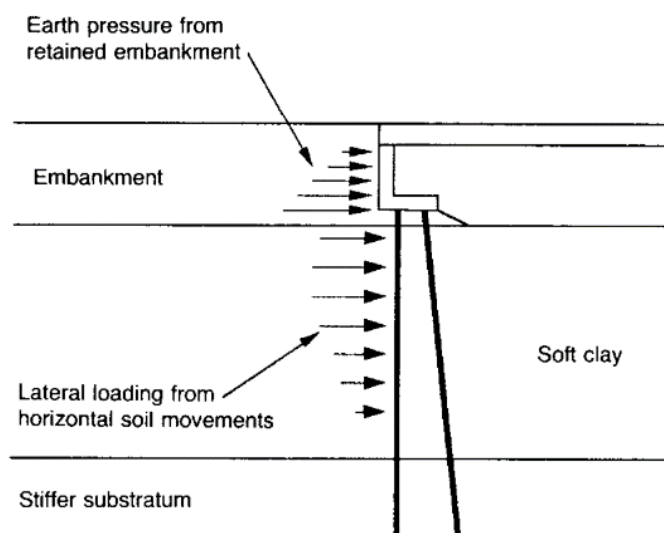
Bridge abutment piles subject to lateral loads due to settling embankment (Stewart et al., 1994)
